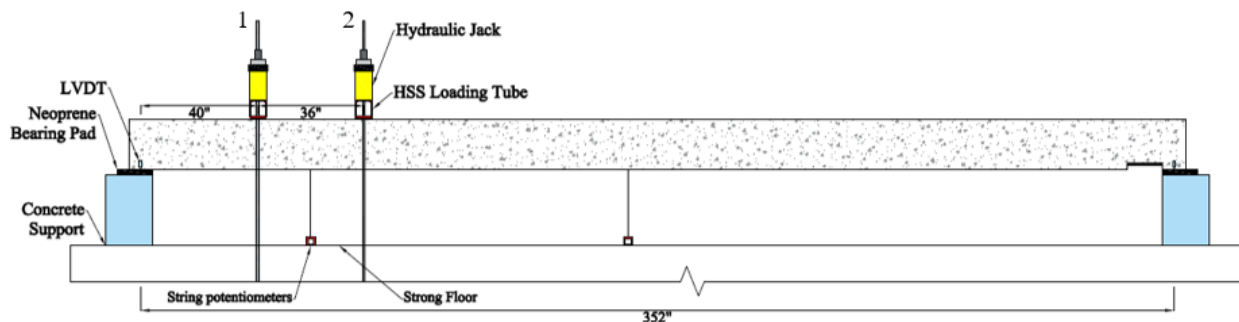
C-U-S2 (Test 1 on Beam 1).
